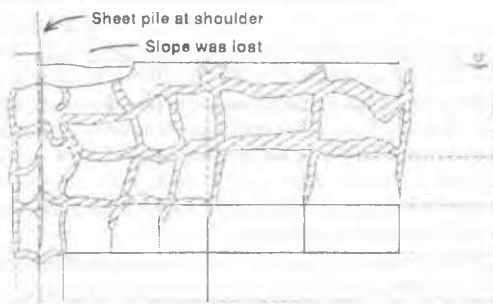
Significant distortion of dike model with sheet pile walls at shoulders.
